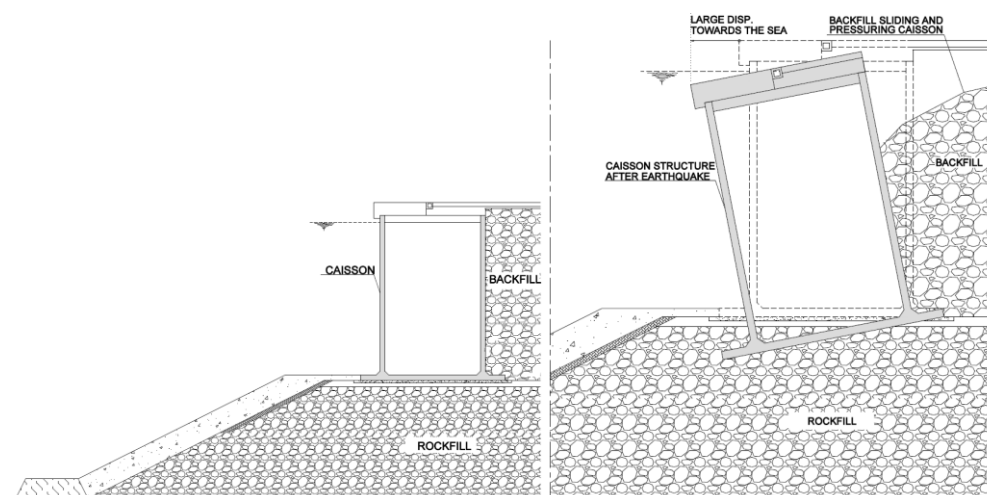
Caisson quay wall, (a) Typical cross-section, (b) Damage representative drawing
